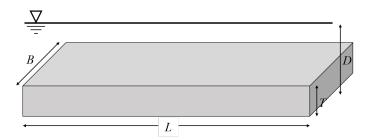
Primary Pile-Cap/Footing Dimensions..
